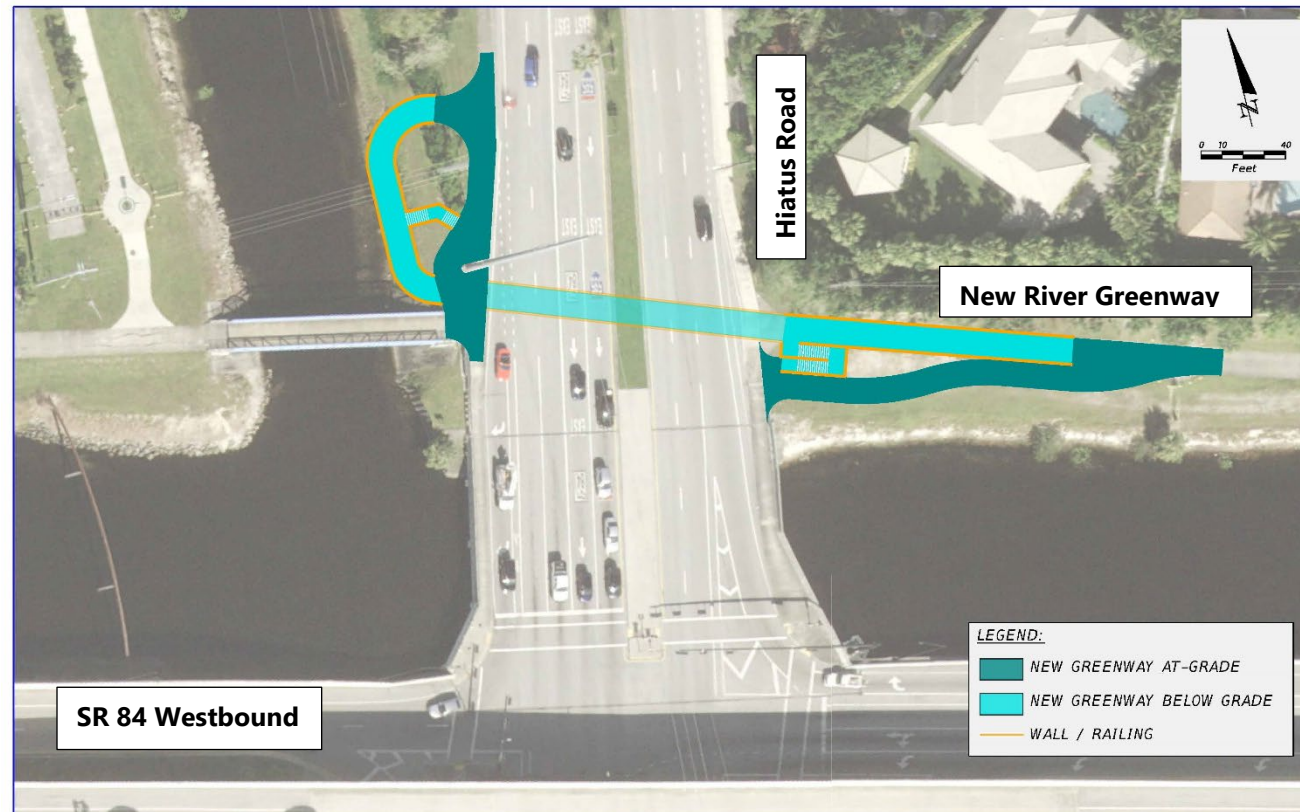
New River Greenway Underpass Crossing Concept Plan Option A
